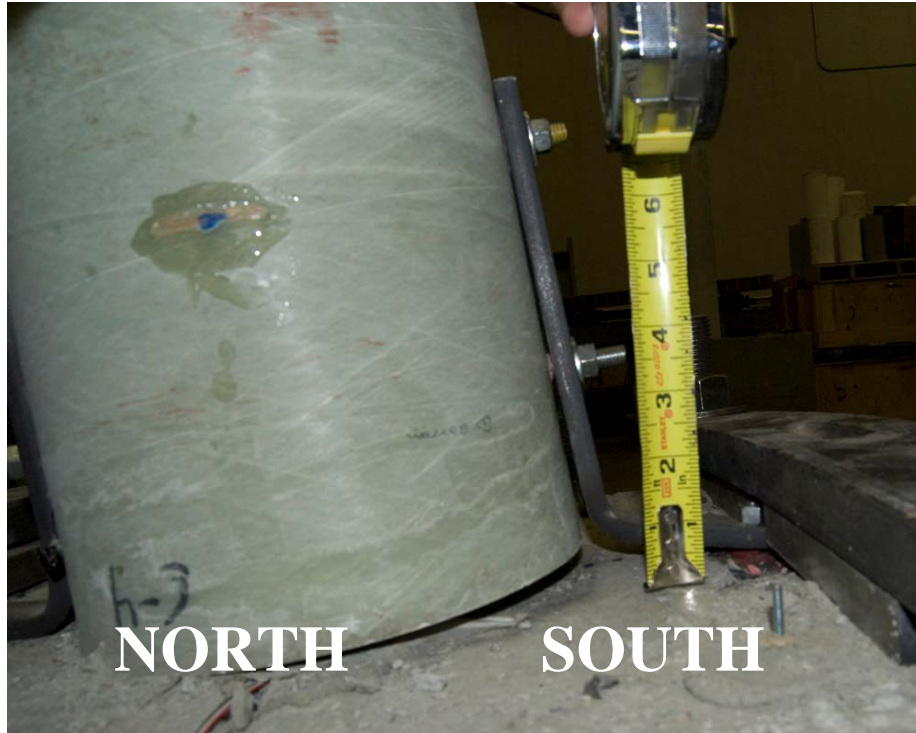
Specimen FRP-T Steel Angles After Testing
